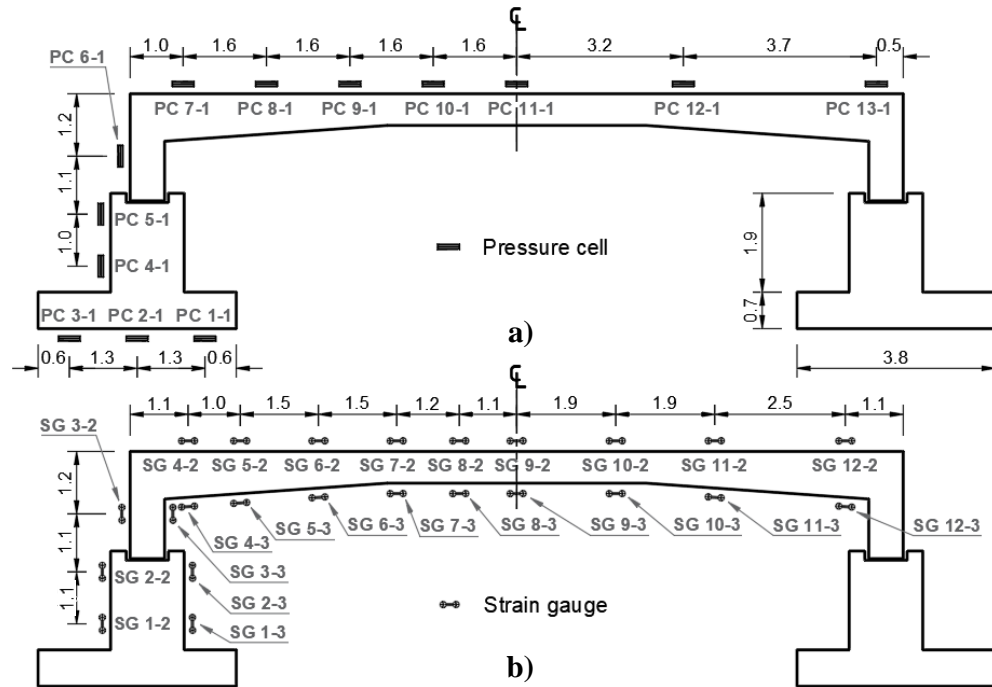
Oshawa culvert instrumentation layout: a) pressure cells; and b) strain gauges. (All dimensions are in m)
